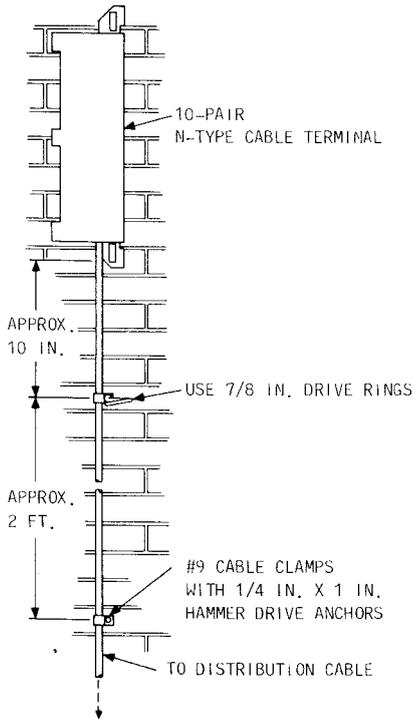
Vertical-Mounted Terminal Above a Horizontal Cable Run
